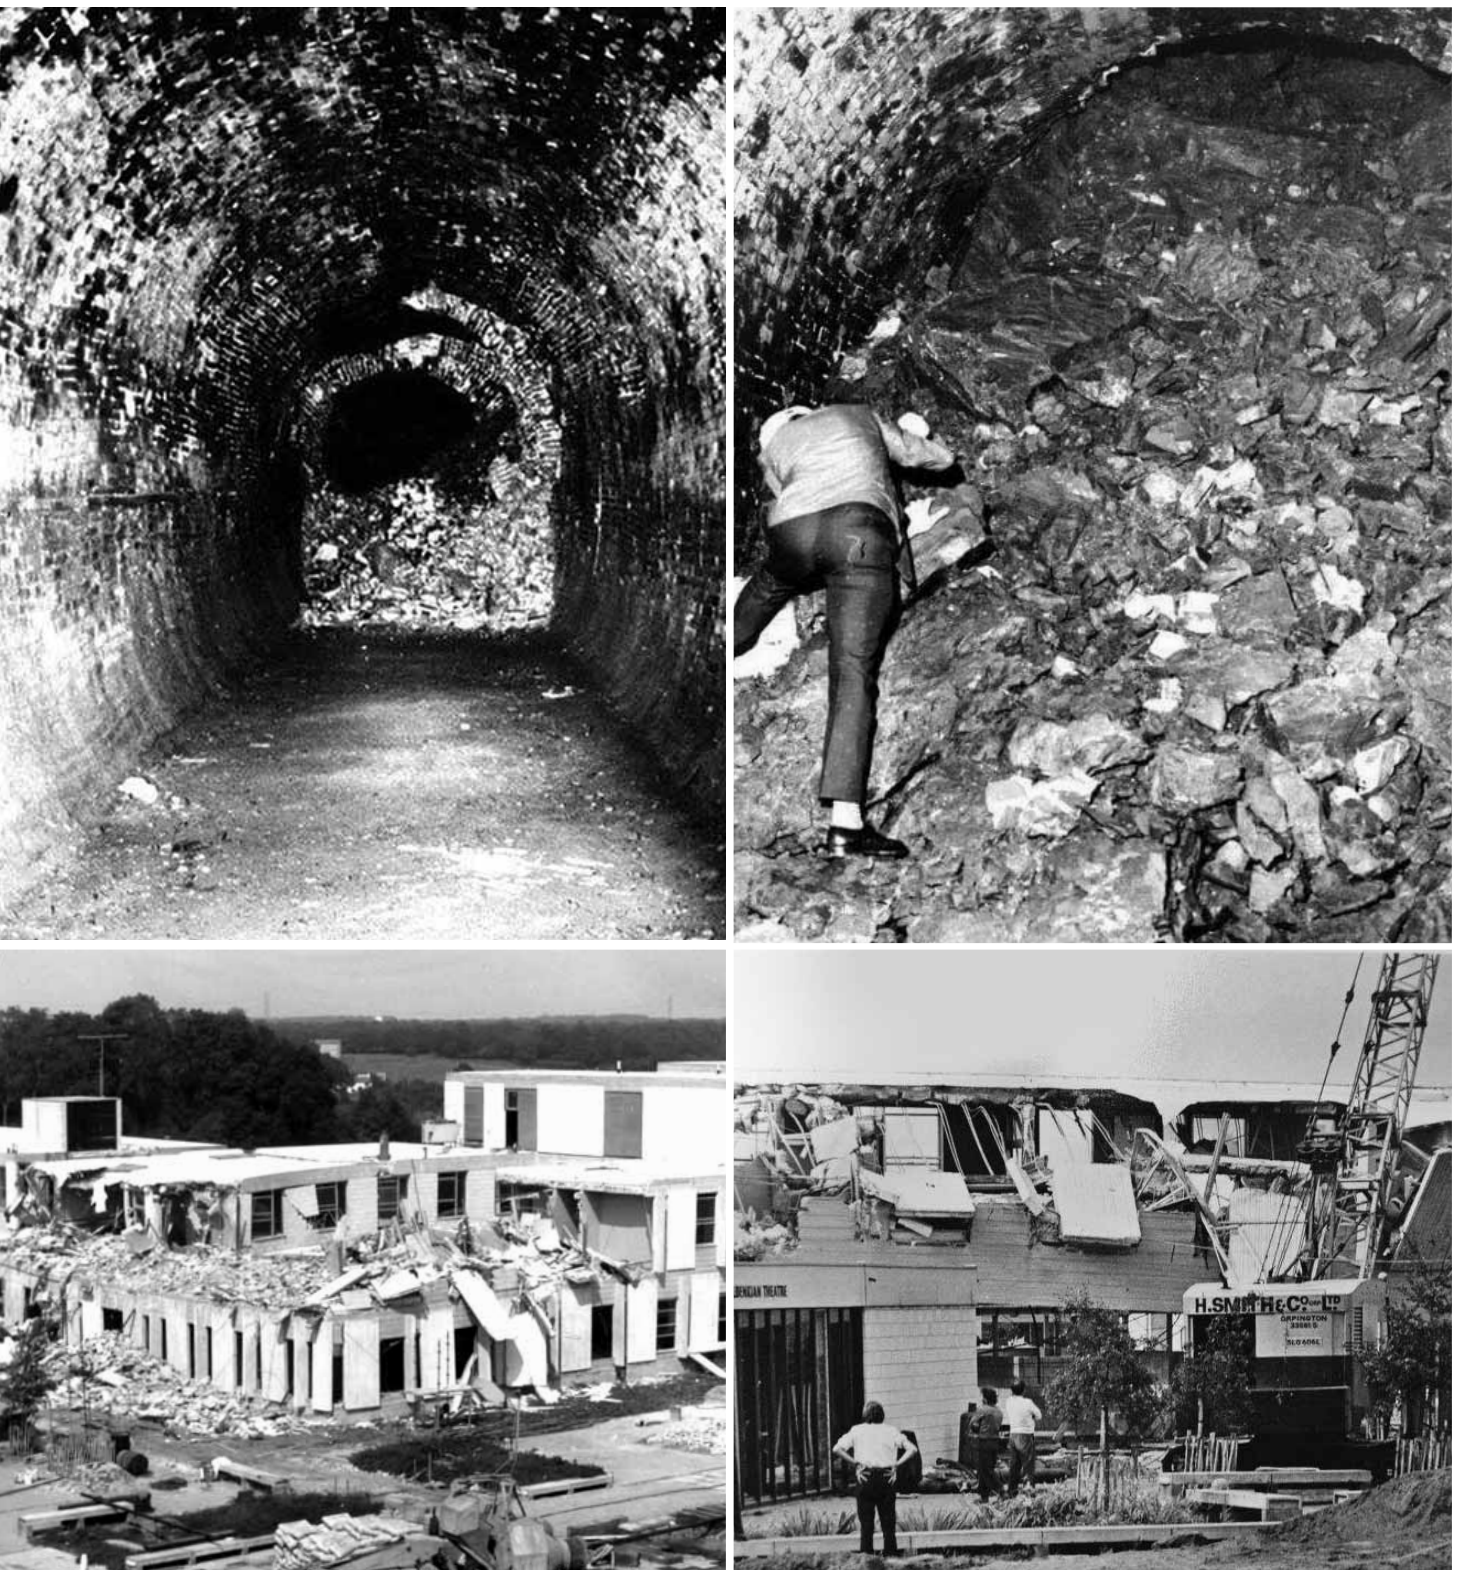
Collapse of the historic Canterbury and Whitstable railway tunnel in July 1974 that caused extensive damage to the Cornwallis Building
